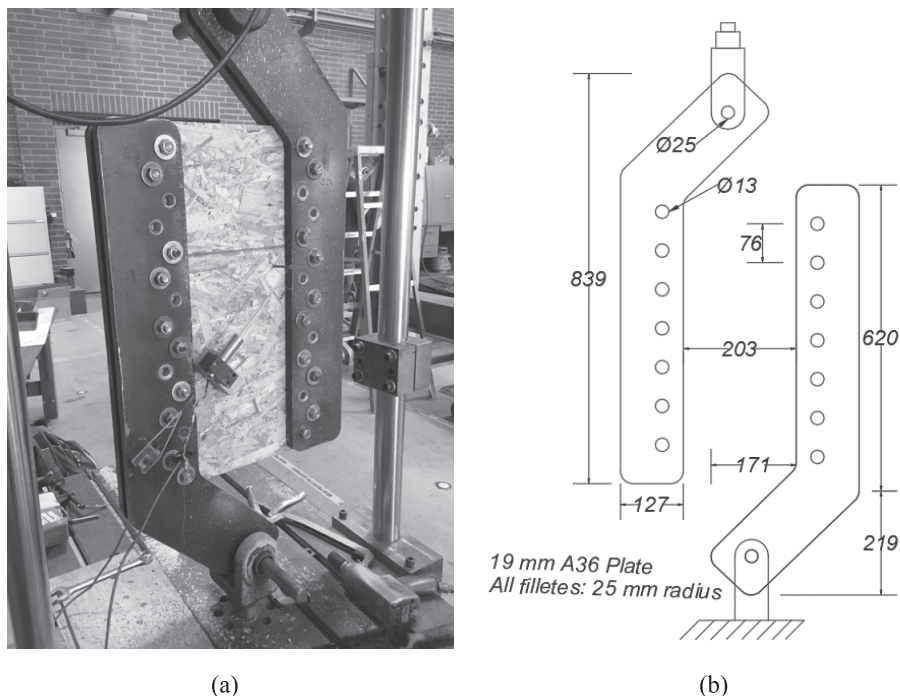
Test specimen: (a) specimen in modified ASTM D2719 shear test apparatus and (b) dimensioned schematic of test apparatus. All dimensions are in millimeters.
